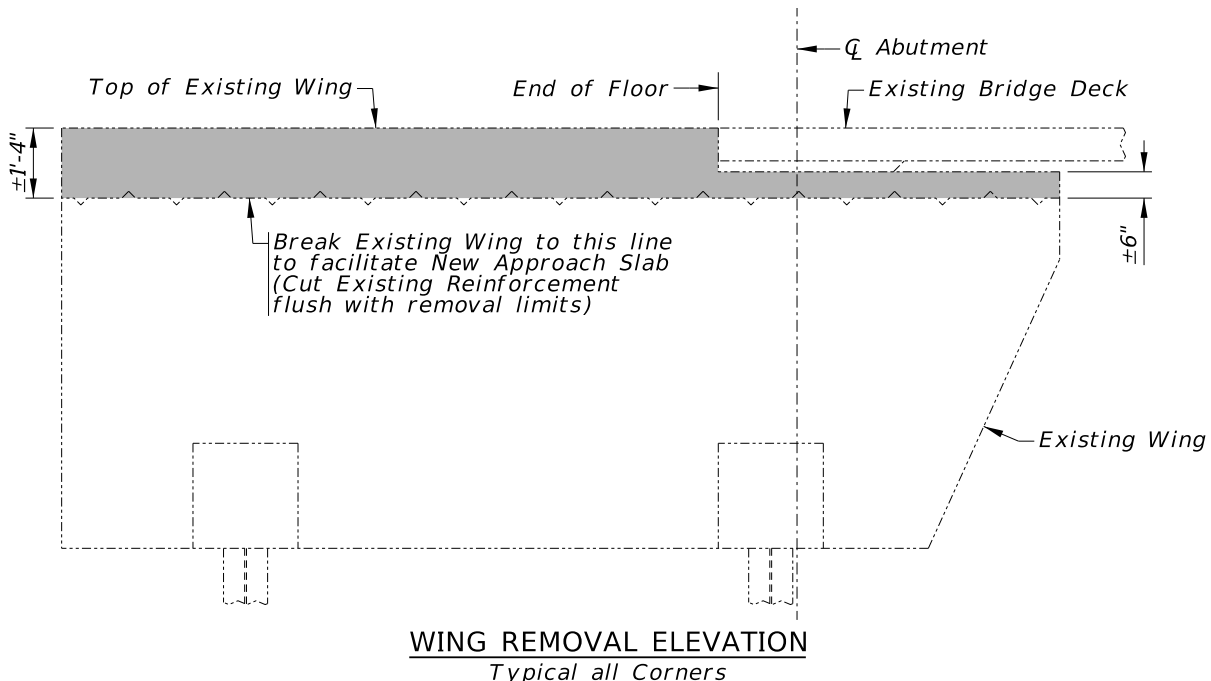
Partial Wingwall Removal to Accommodate New Approach Slab (example taken from S006 36293)
